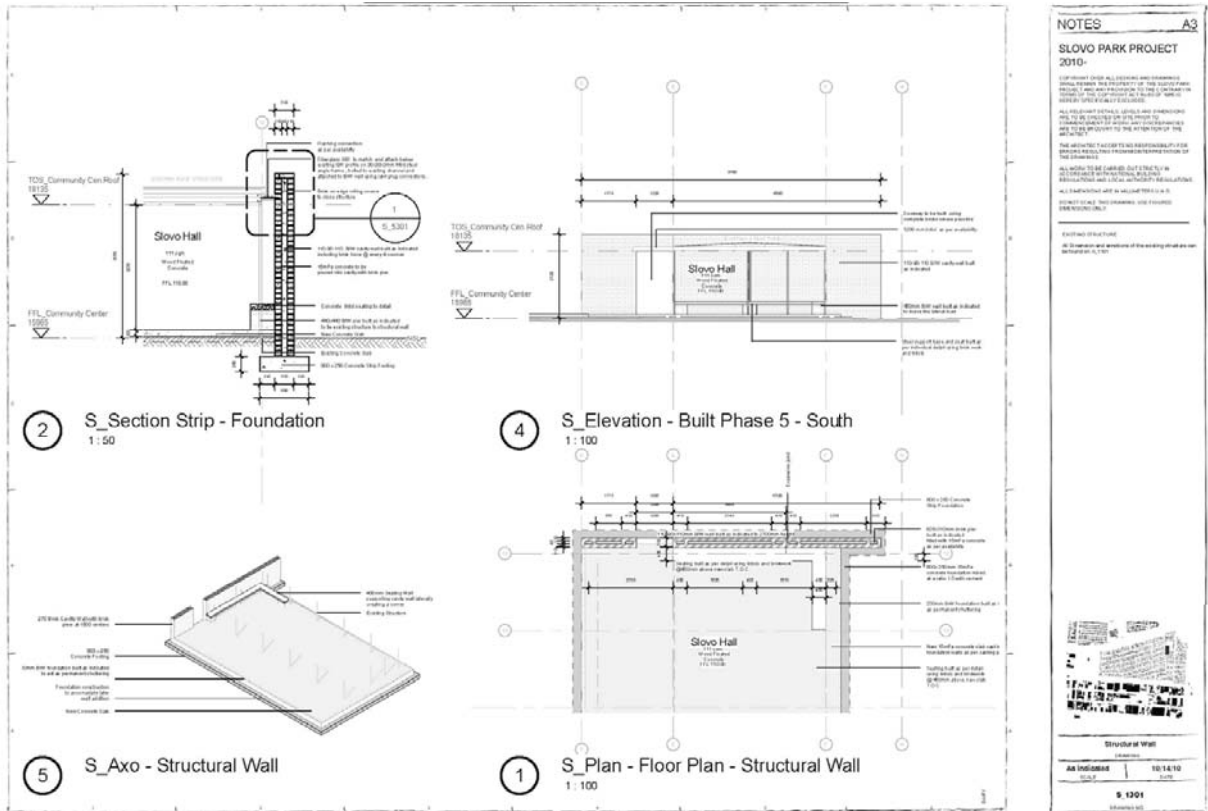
Architectural renditions of proposed upgrade of community hall –structural wall, paving and gum pole detail (Bennett 2010)
